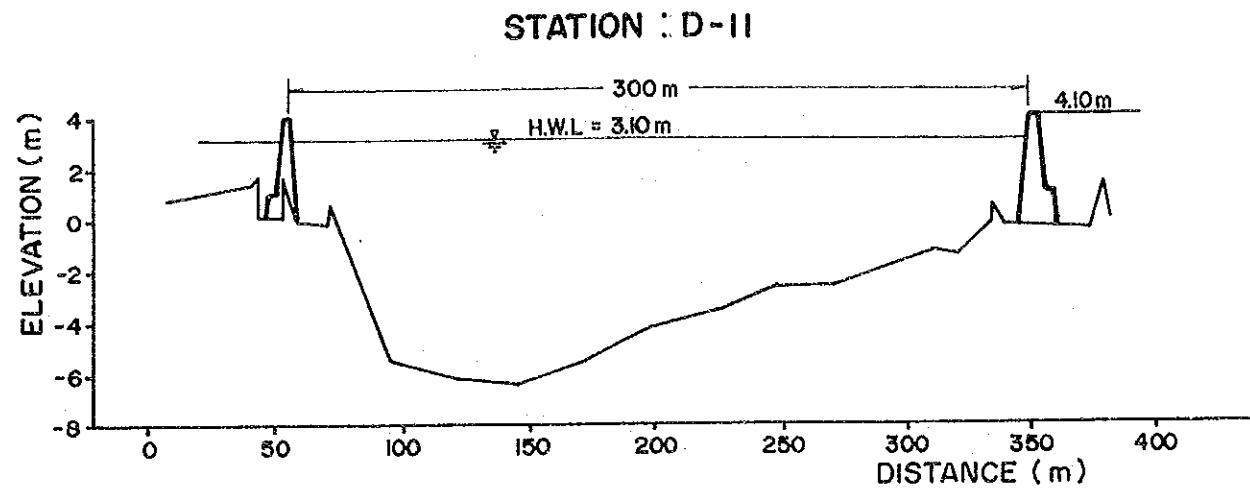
TYPICAL CROSS-SECTION OF DAGUPAN RIVER
